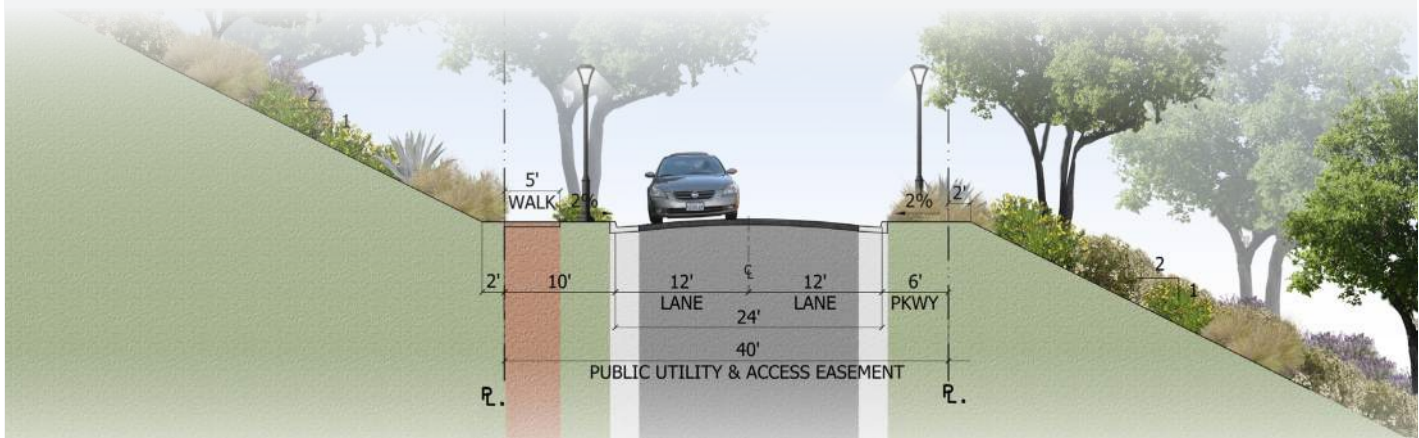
Street Section - Coromell Trail (Private, TTM lot G)
